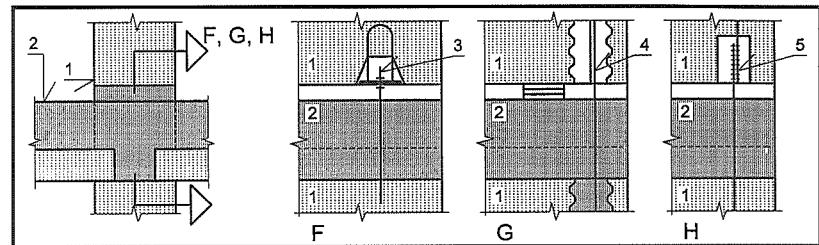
Load Bearing Wall-Load Bearing Wall, Tensile Joints
